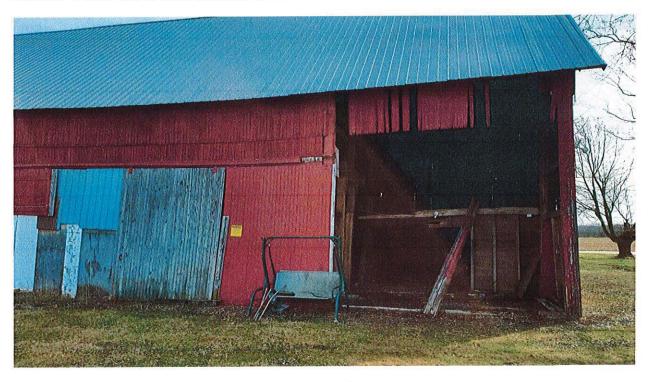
Missing west wall of barn from recent 2024 wind storm.
